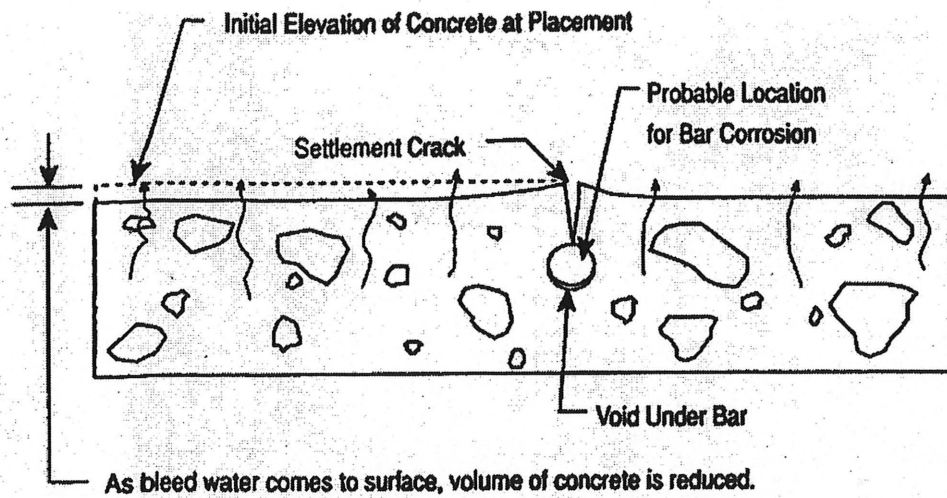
Schematic representation of settlement in a slab. Settlement crack can be seen over the reinforcement bar (Gagné, 2003)
